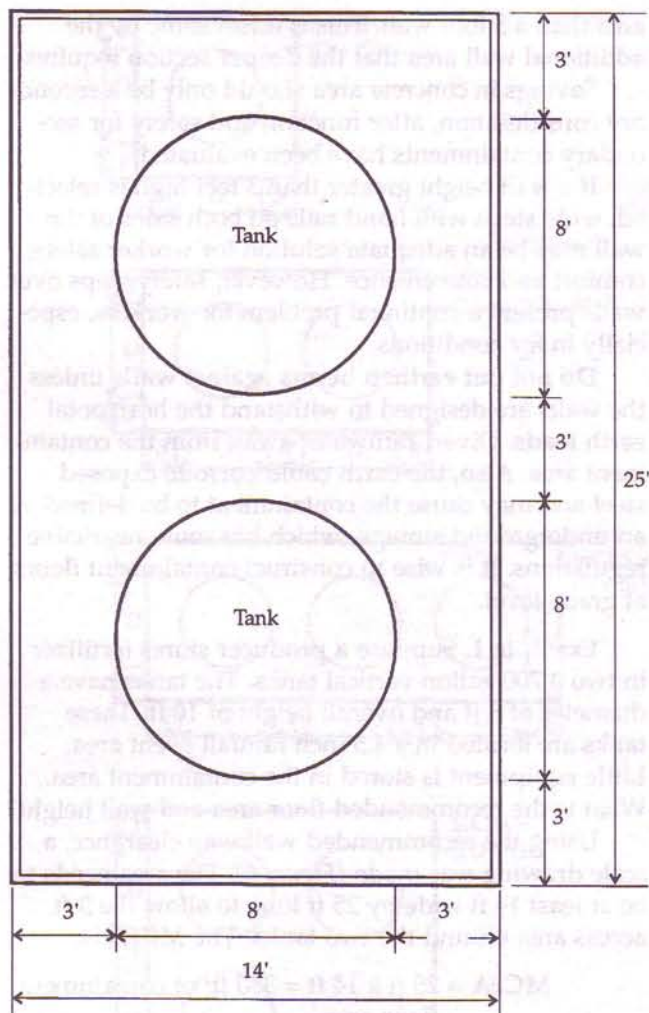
The top view of the Minimum Containment Floor Area (MCFA) for two vertical tanks used in Example 1.
